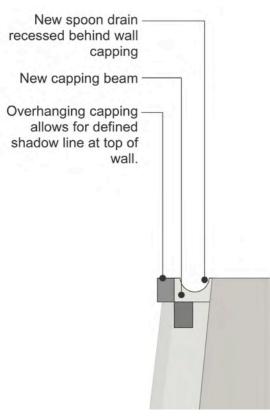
Section showing overhanging wall capping and concealed spoon drain along the top of the retaining wall
